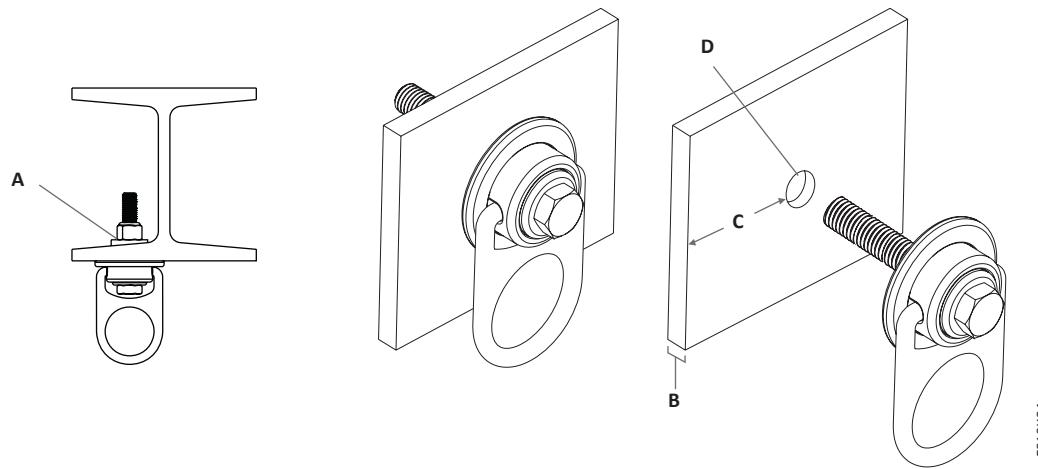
A: Minimum Installation Requirements for Bolt Thru Steel
